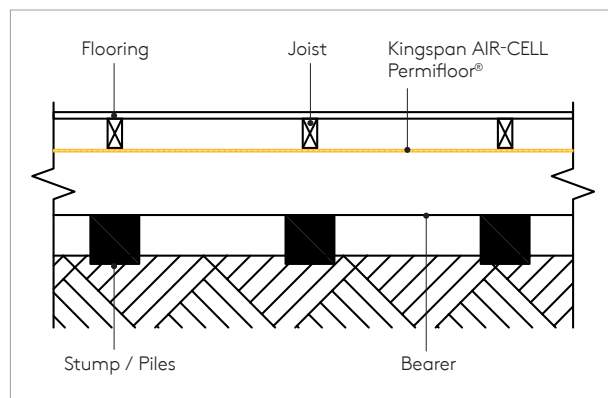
Side elevation of Kingspan AIR-CELL Permifloor® in a suspended framed floor.
